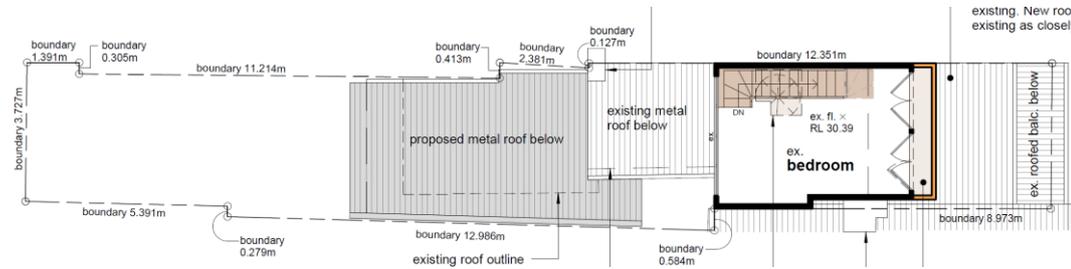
Proposed second floor plan – 3 Oswald Street Randwick (Source: John Spiteri Design and Drafting)
